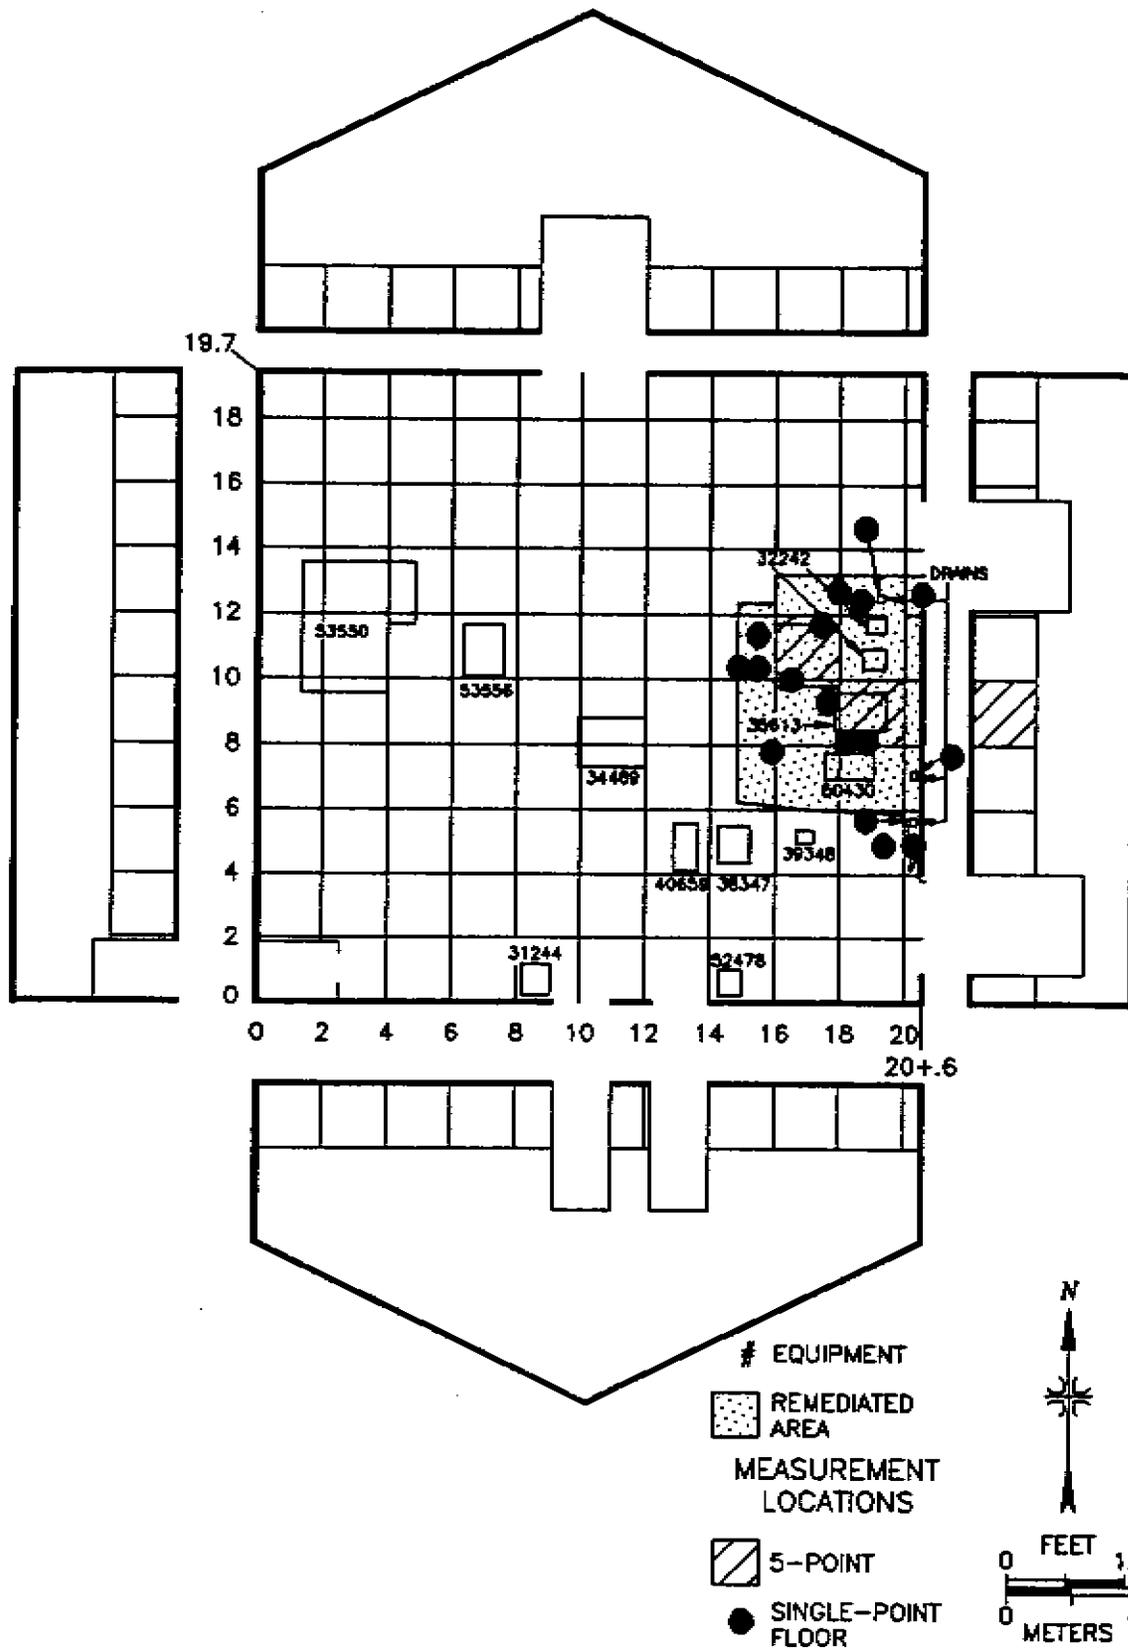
Building 30, Fabrication Room, Indicating Equipment Locations and Measurement Locations of East Floor
